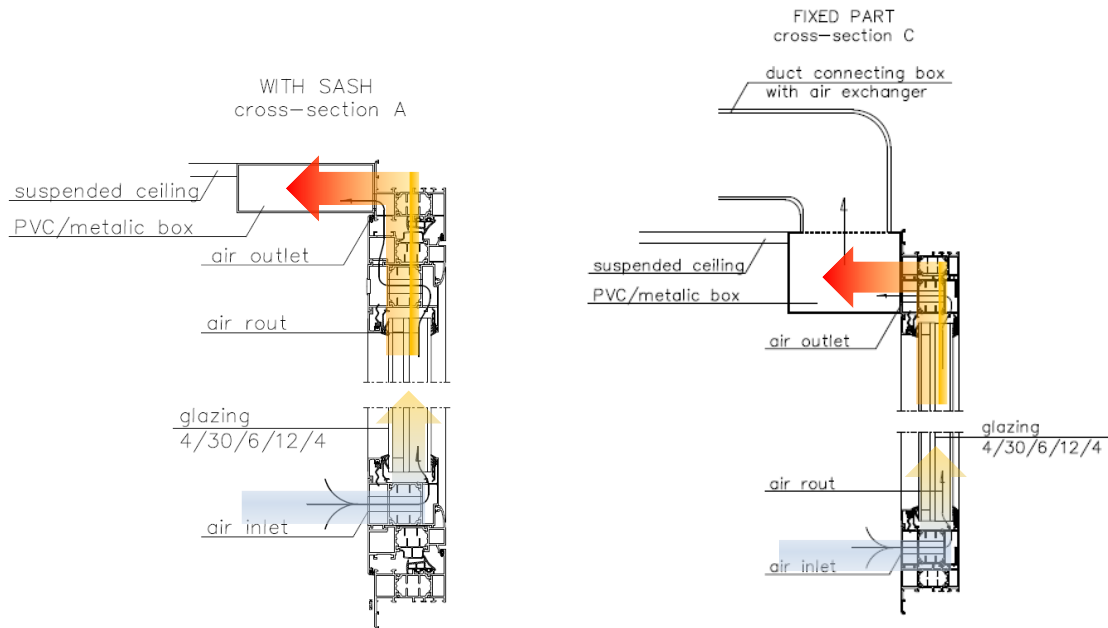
Vertical section – window and duct connection (D2.3 Prototype and report on Ventilated window design)
